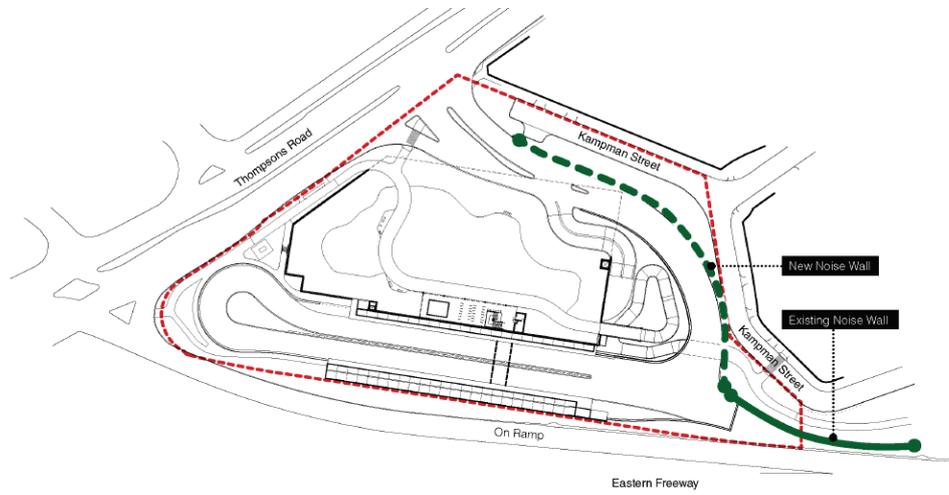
Location and extent of noise wall (UDLP drawing 8)
